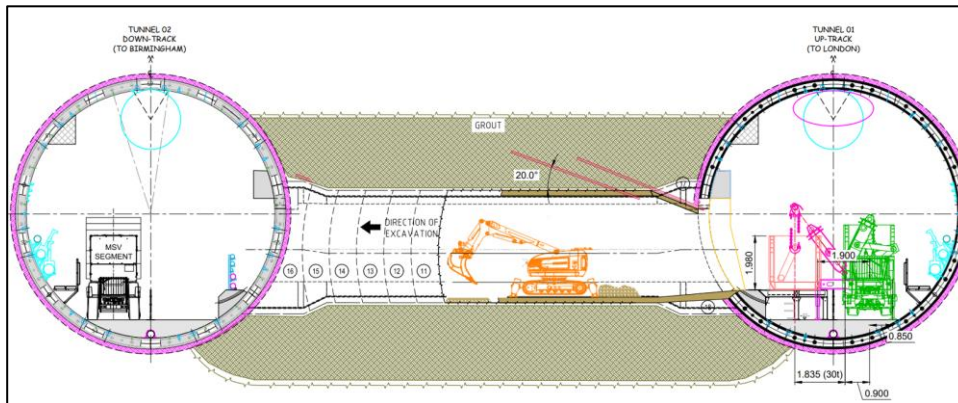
Schematic diagram of cross passage excavation works between main twin bore tunnels.
